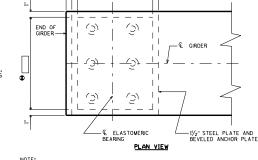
PLATE 'E' DETAILS (SEE STD. 40.10 FOR CONCRETE BLOCK ALTERNATE)
